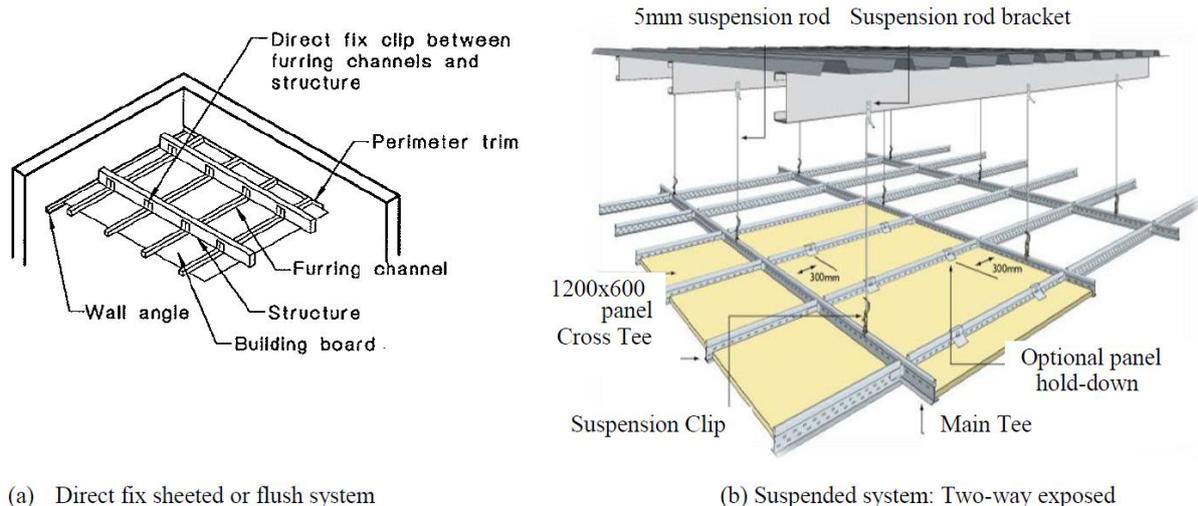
Direct and suspended ceiling systems (adopted from Dhakal et. al. 2011)
